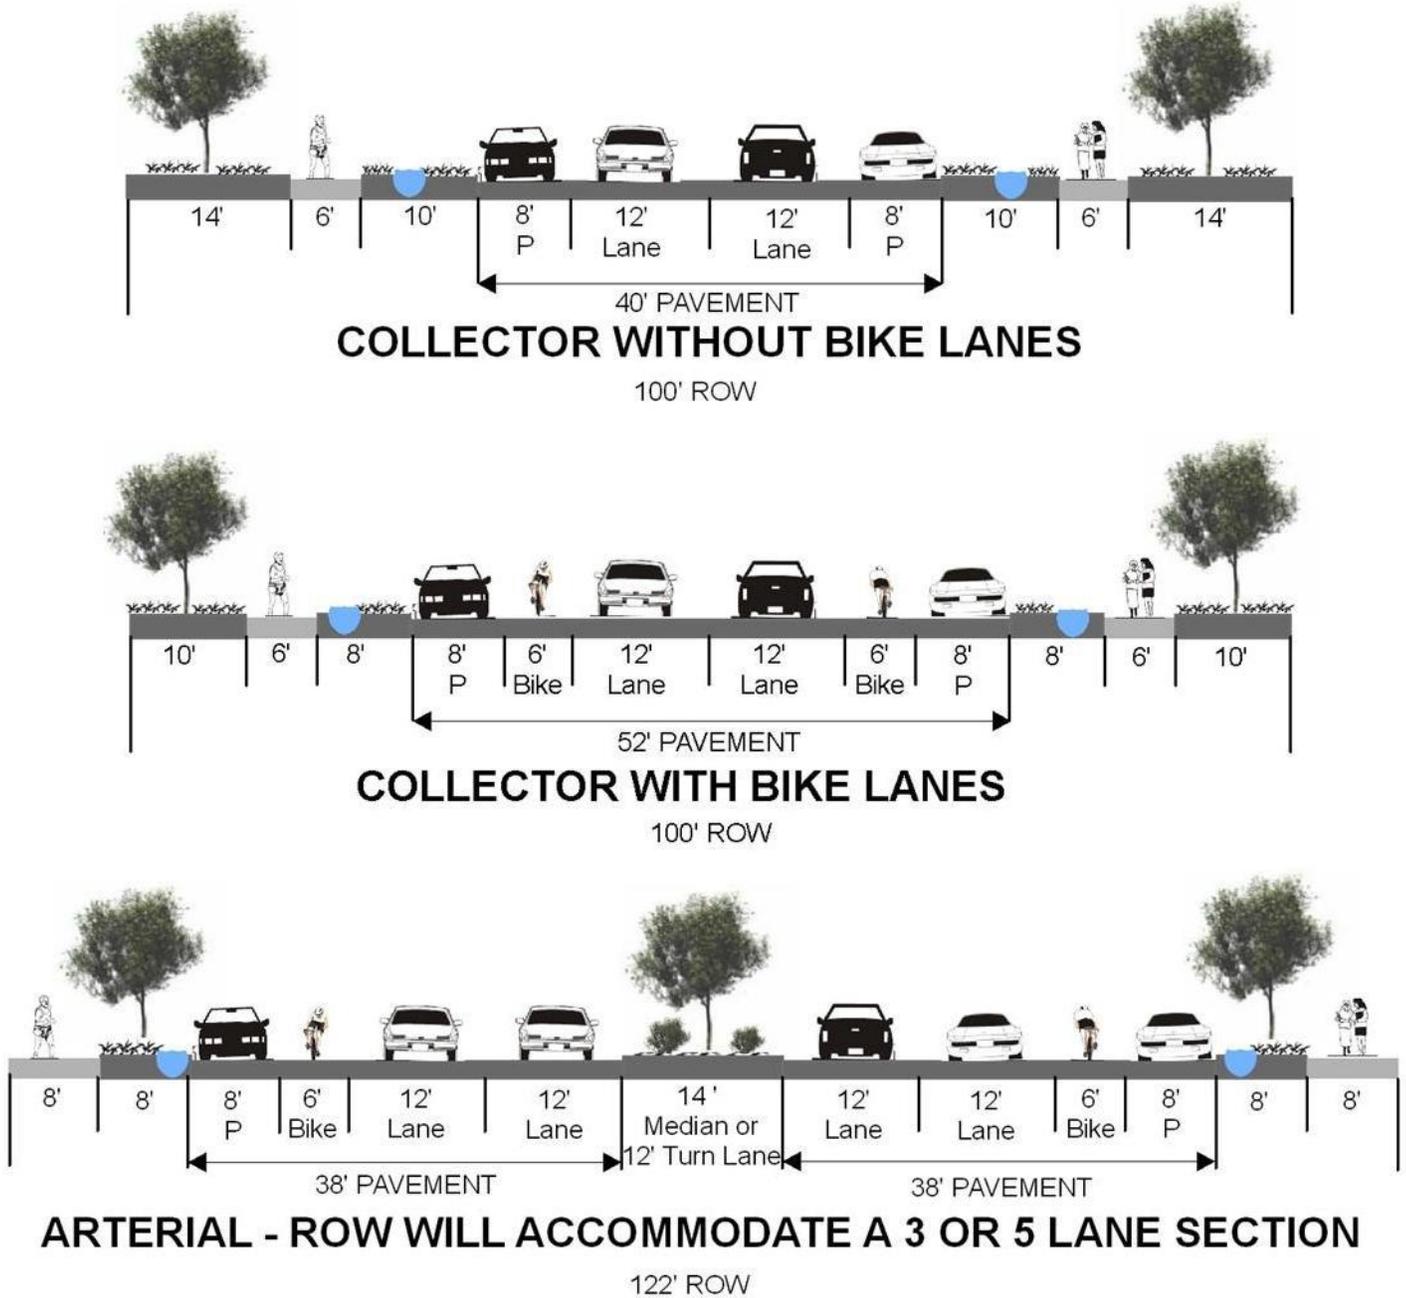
ROAD CONSTRUCTION STANDARDS (CONTINUED)
